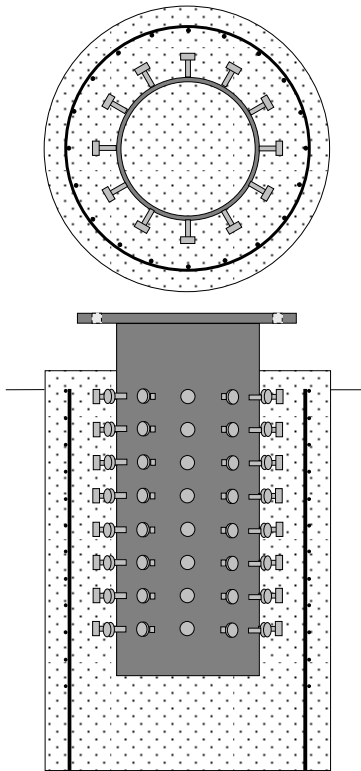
Alternate foundation: pipe with welded studs
